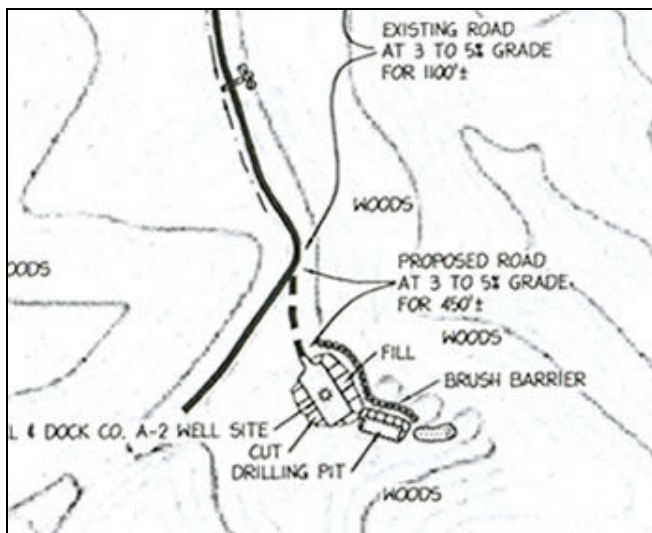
Part of drawing submitted for 47-079-01283 permit application showing sketch plan of well site, pit and sediment control. Another well was instead drilled nearby in almost the same location (47-079-01314). Compare this drawing with satellite photo of drilled well site in 2005 (photo 4). Hatched portion of access road is shown in photo 19.
